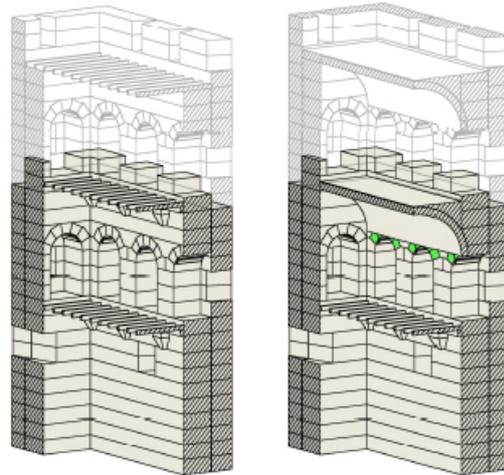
Isometric section of the tower; authentic construction with wooden ceilings (left), and after the construction of masonry vaults (right) (Source: Hof, 2015, p. 307)
